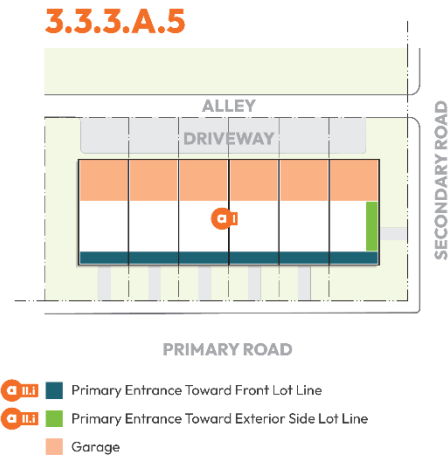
Townhome Orientation - Street Right-of-Way, With Alley
